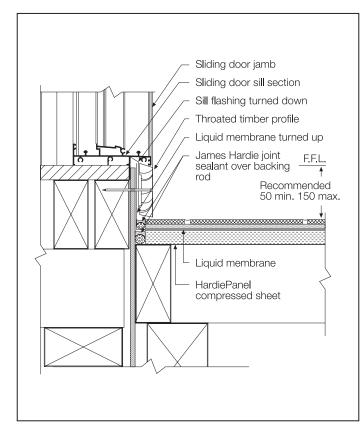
METHOD 2 - STEP DOWN AT DOORWAY DETAIL
